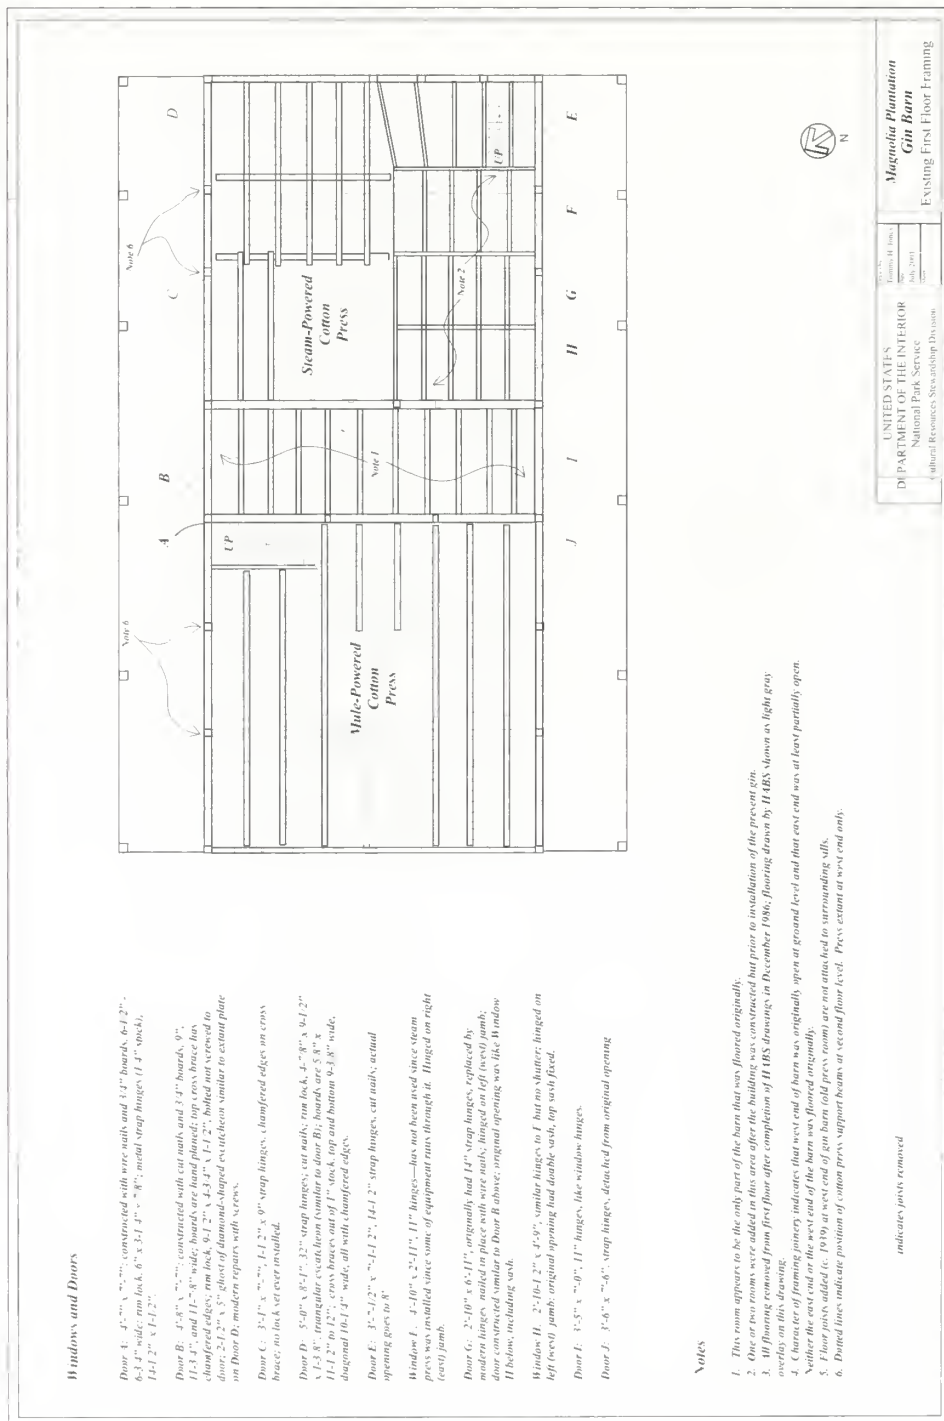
Plan of existing floor framing. (NPS-SERO-CRS, 2001)
